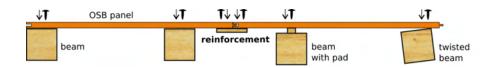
Scheme of laying a platform made of OSB plates on beams in a longitudinal section.
